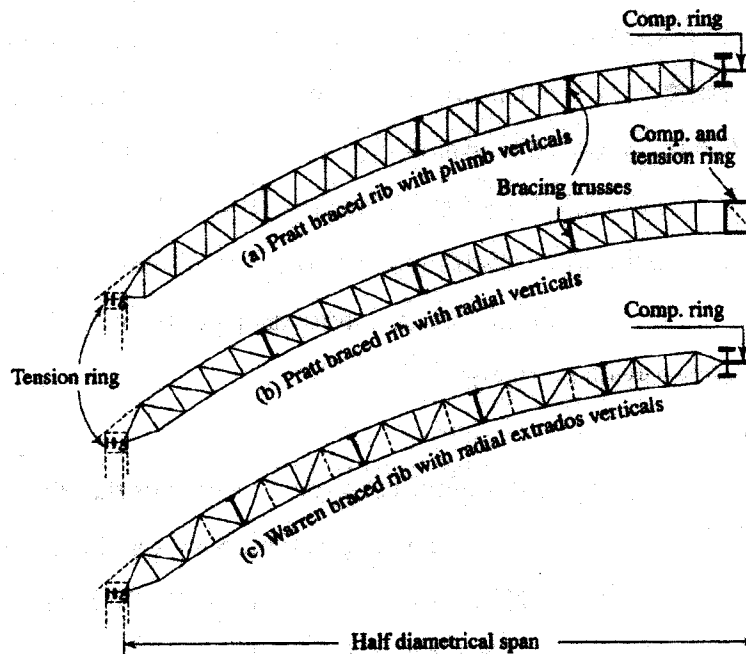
Typical Braced Dome Sections (Narayanan, 2006)
